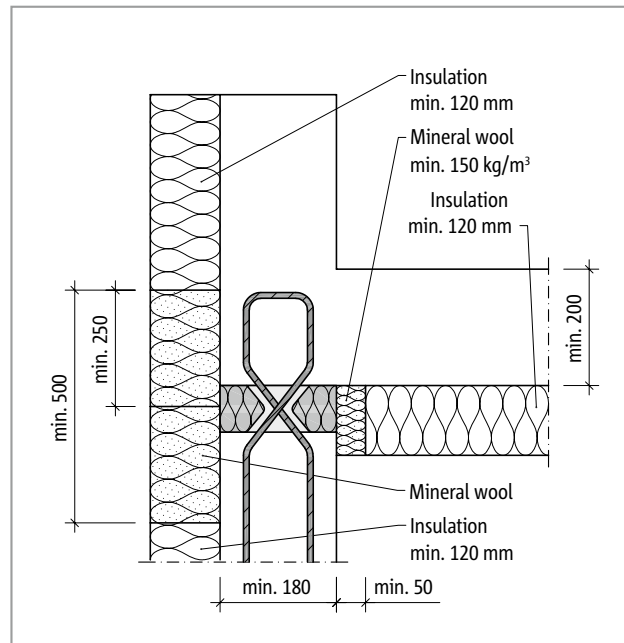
Schöck Sconnex® type W: R 120 / EI 120 with external wall and under-slab insulation
